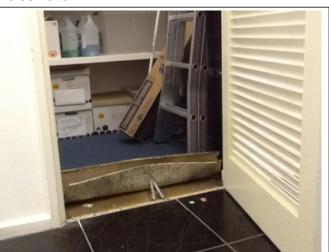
NT0554-334 Result: Asbestos - Positive Building/Level: Main Building - Anglicare-Ground Level Room/Location: Storage Cupboard-Throughout Feature/Material: Floor Covering-Vinyl Tiles & Adhesive
